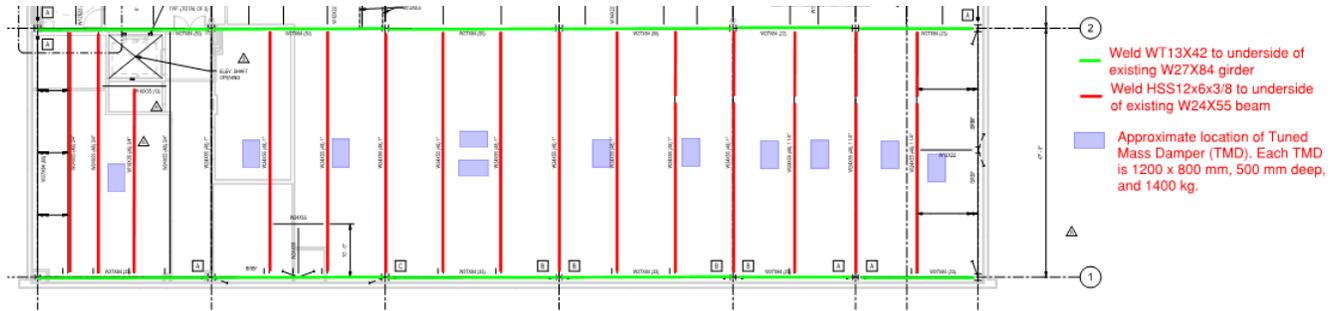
Case 6 – Level 2 structural framing plan showing location of new WT and HSS members and TMDs
